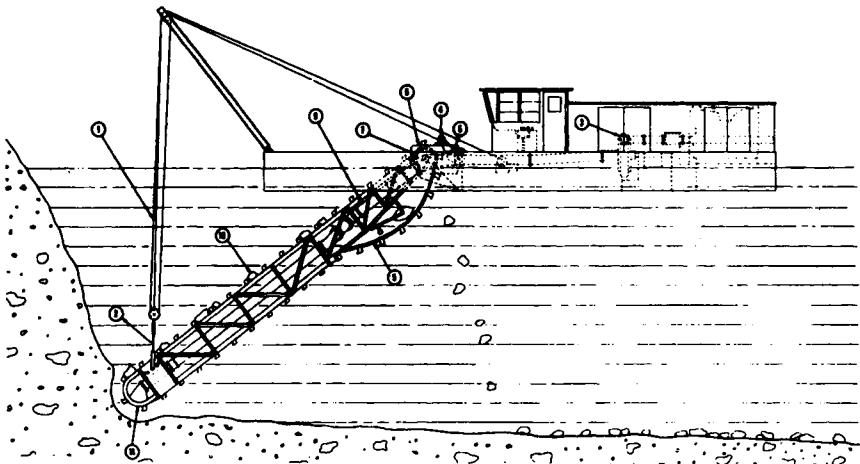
Endless chain cutter. Courtesy: Eagle Iron Works.
